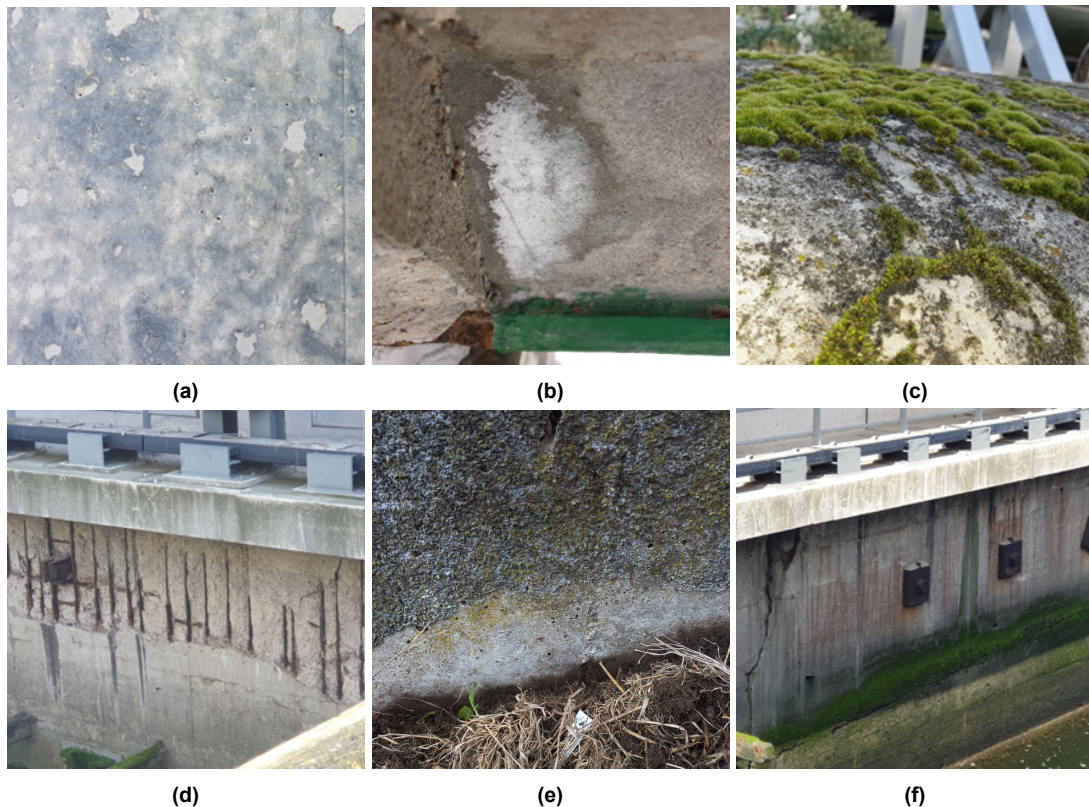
Concrete surface texture examples: (a) Concrete coated, (b) Concrete efflorescence, (c) Algae growth, (d) Steel corrosion and concrete cover damage, (e) Concrete coated and visible concrete surface, (f) Crack, dirt and dust
